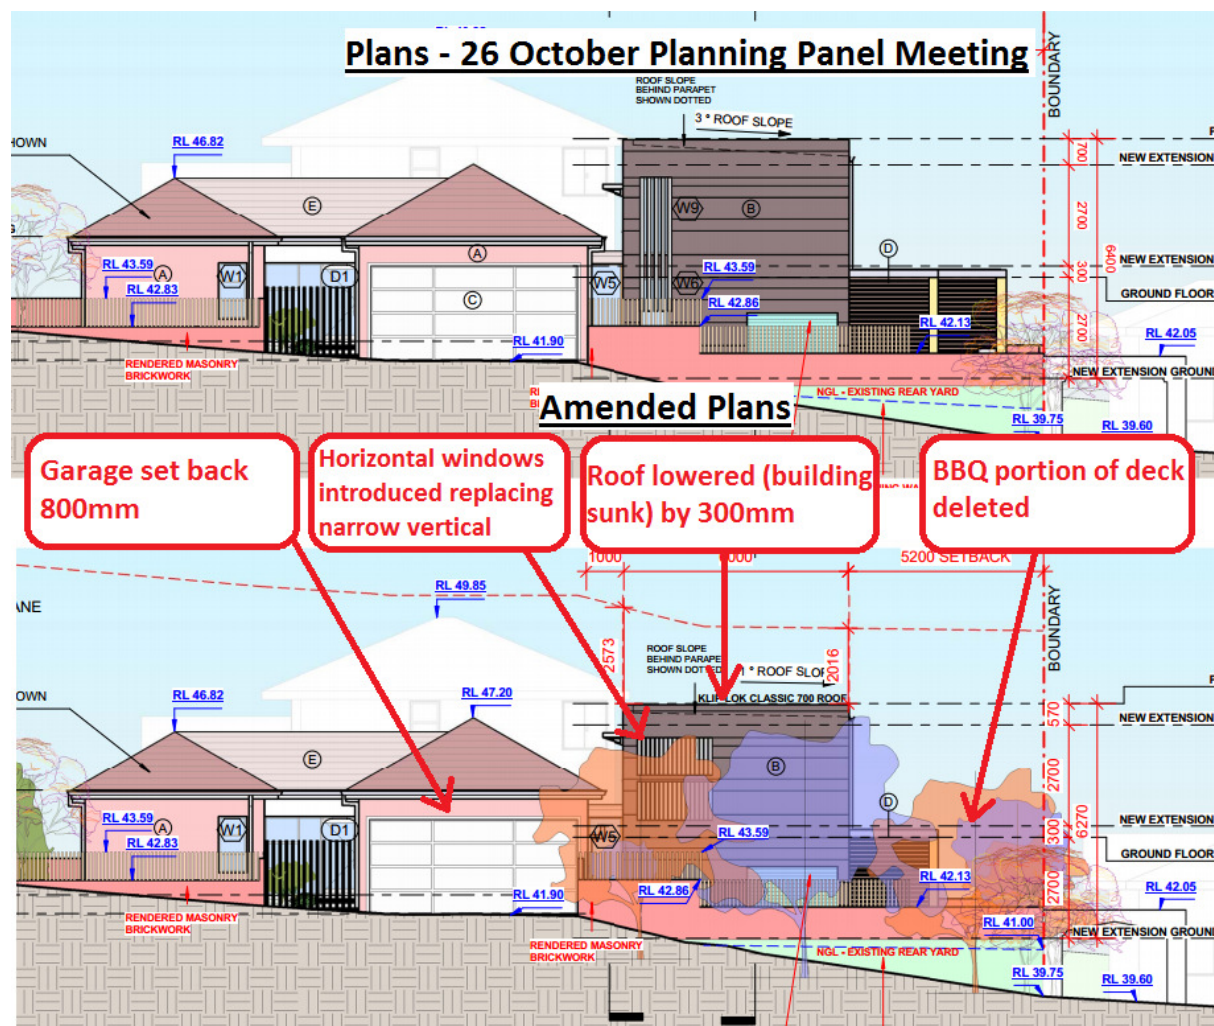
Comparison of Western Elevation (Hutchinson Street) of previous plans (top) to amended plans (bottom),
